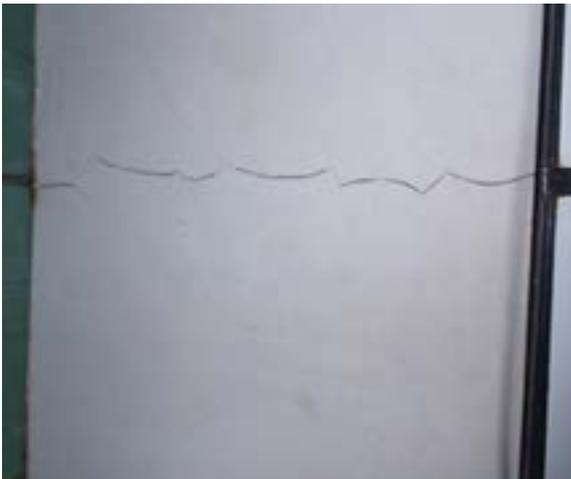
Cracks in plaster on west wall, 2011.
